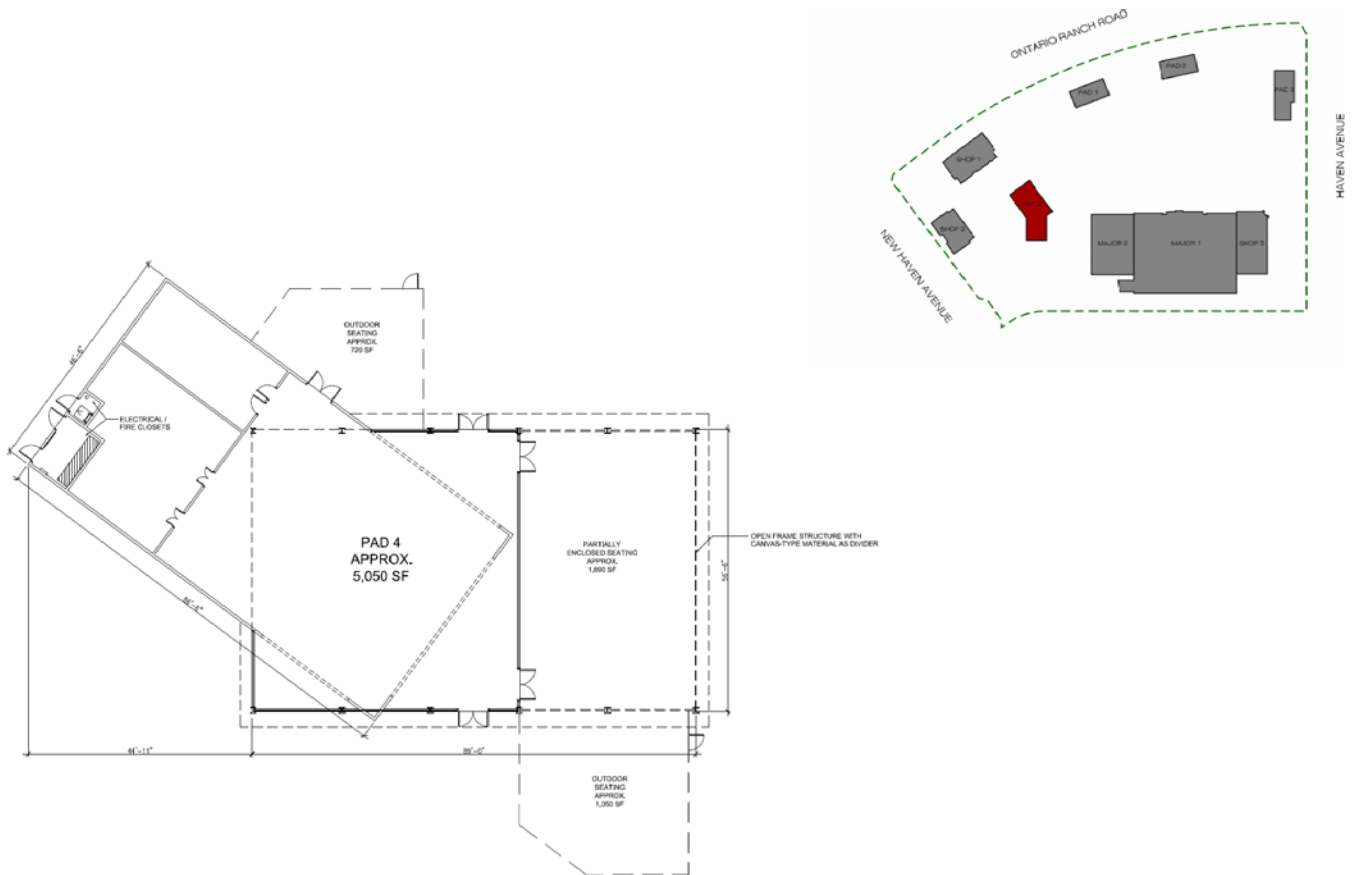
Exhibit B — FLOOR PLAN AND EXTERIOR ELEVATIONS – PAD 4
